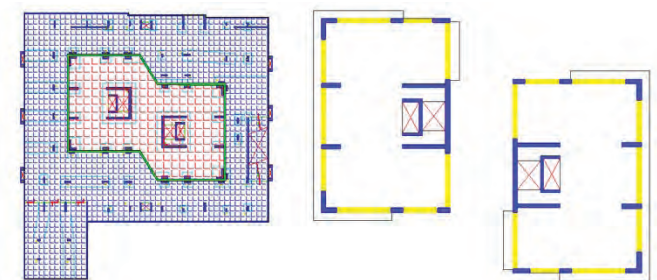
Typical Floor Plan - Fixed base underground (in blue), seismically isolated sector (in red), isolation gap (in green) and typical layout isolated towers (right)
